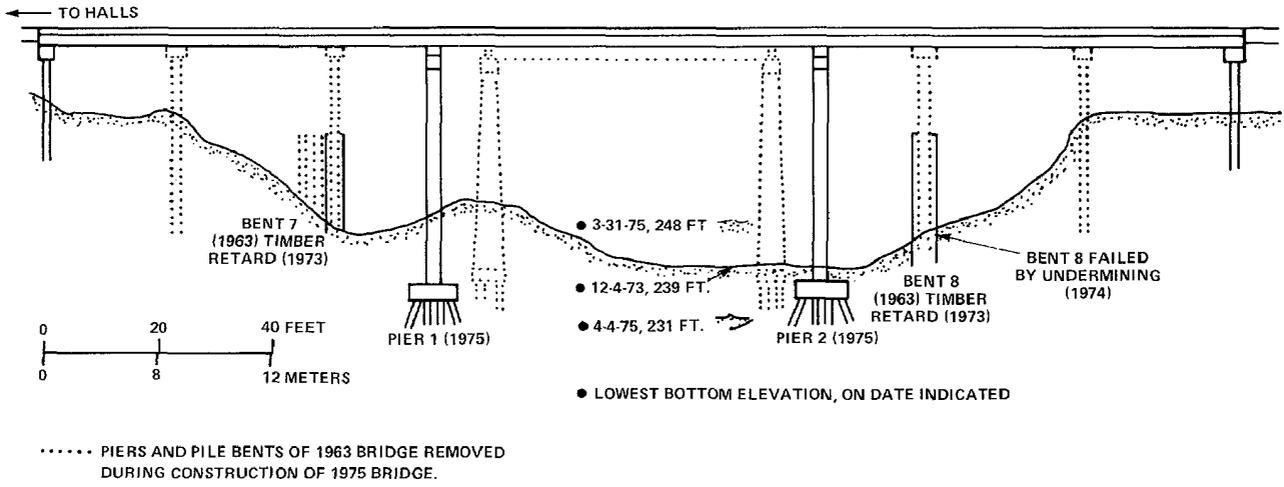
ELEVATION SKETCH OF U.S. HIGHWAY 51 BRIDGE
